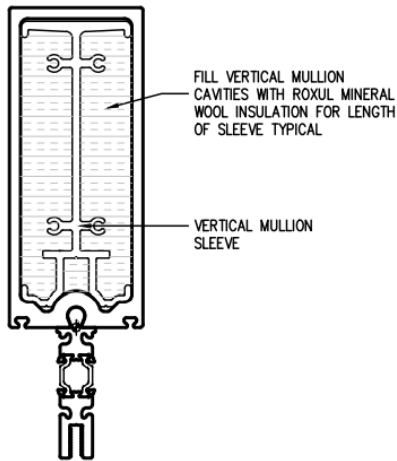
Framing Cross-Section (Top View) with Vertical Mullion Sleeve and Insulation
